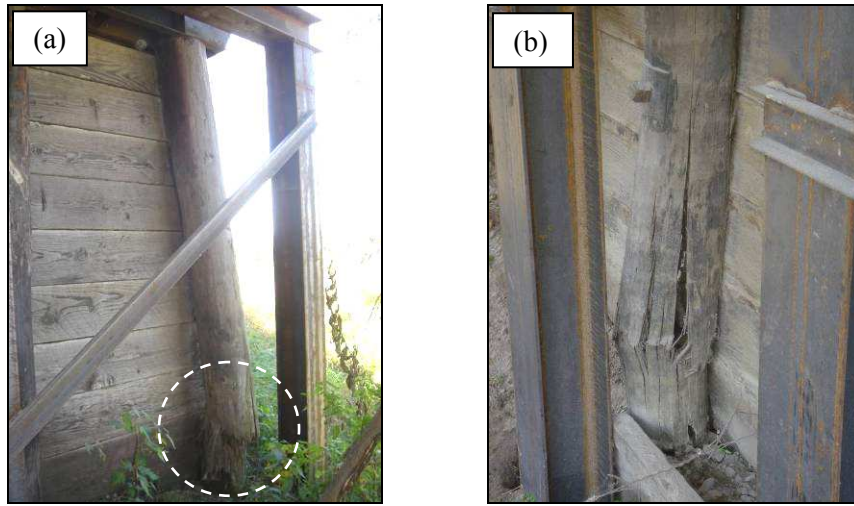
Compression failure of pile section caused by overloading (a) separation of pile section
